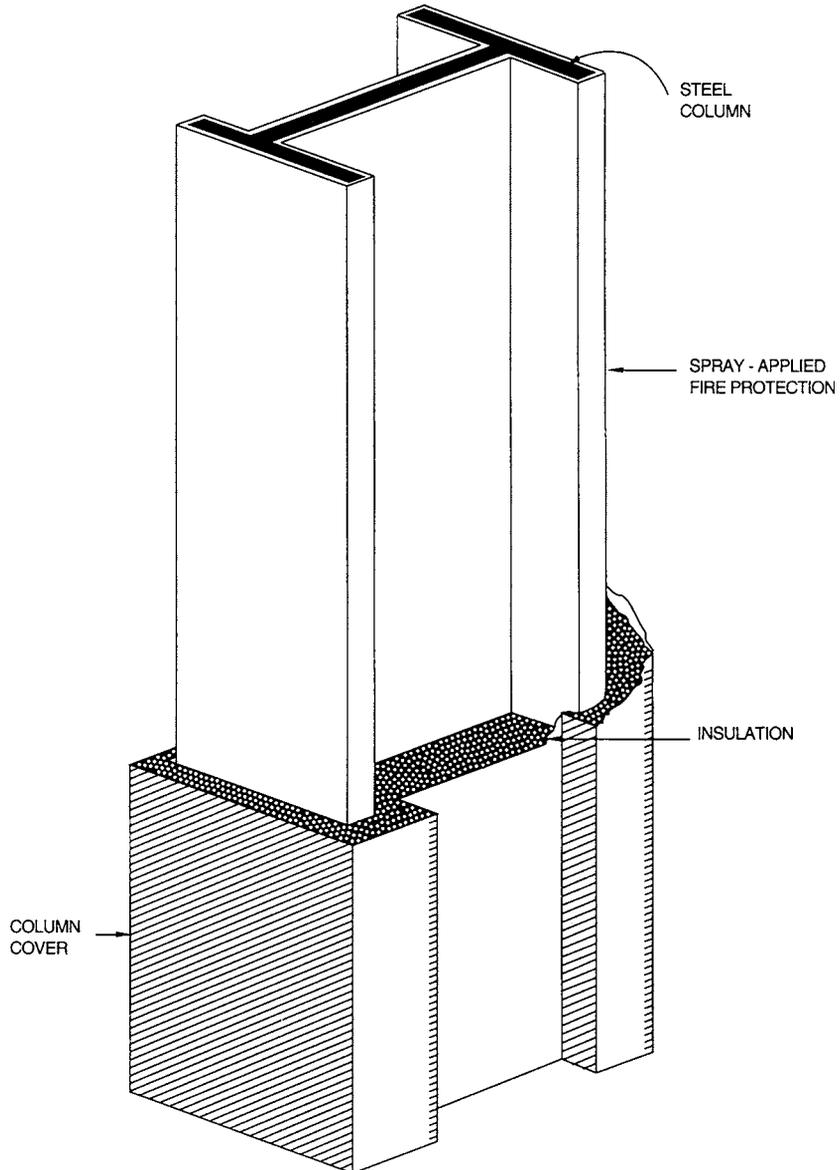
Fire-protected exterior steel column with exposed metal column covers.
